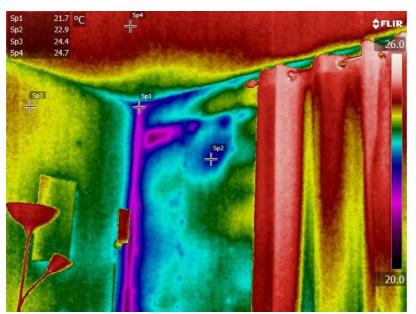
Living room ceiling thermogram. Image shows heat loss through the exposed wall. Cold spot identified on wall.
